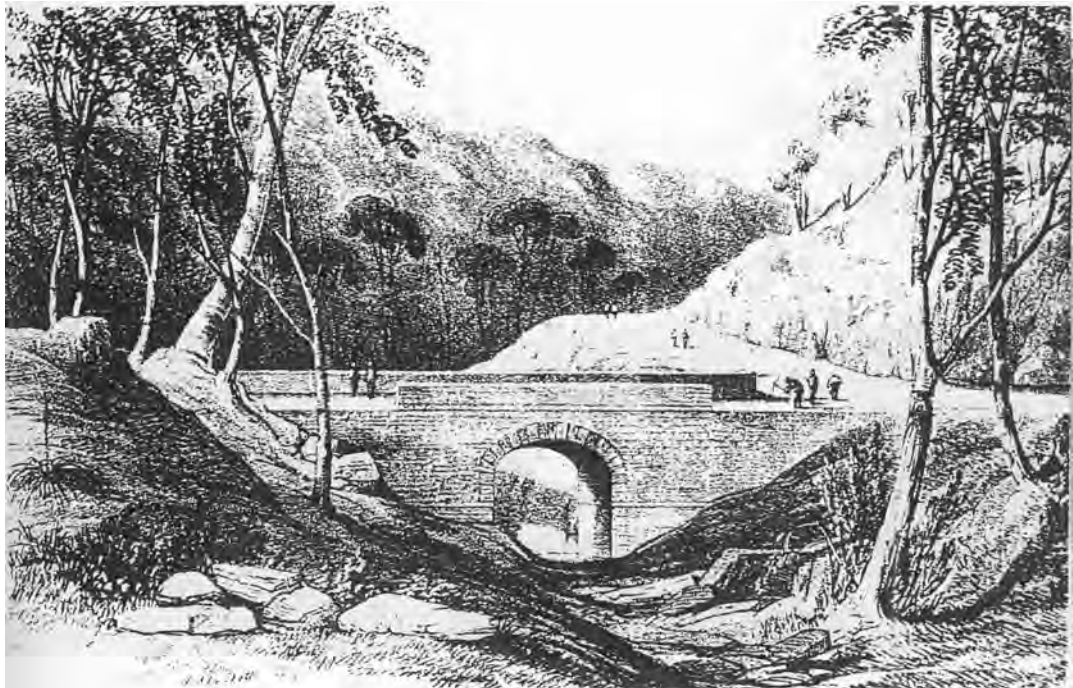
R. M. Westamacott “Road from Emu Plains over the Blue Mountains. First Stone Bridge built in New South Wales. C1834” showing David Lennox Bridge designed by David Lennox and built in 1833. (Dixon Library: reproduced from Karskens, 1988: 54)
